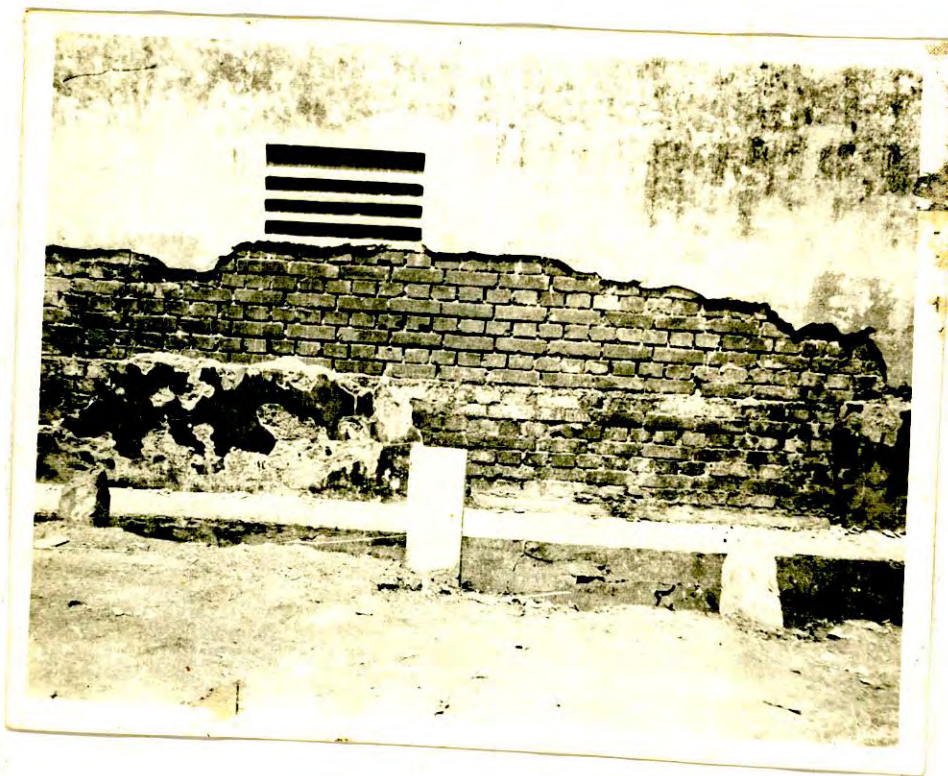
Spalling of plastering on wall in coastal regions.
